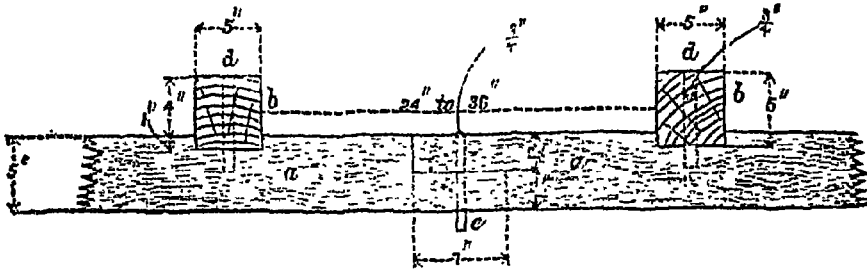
is a side elevation of the Bamsu sledge road, showing the trenailed half-lap joint of the longitudinal; letters as in figures 29 and 30. (Scale 1 foot = 1 inch.)
